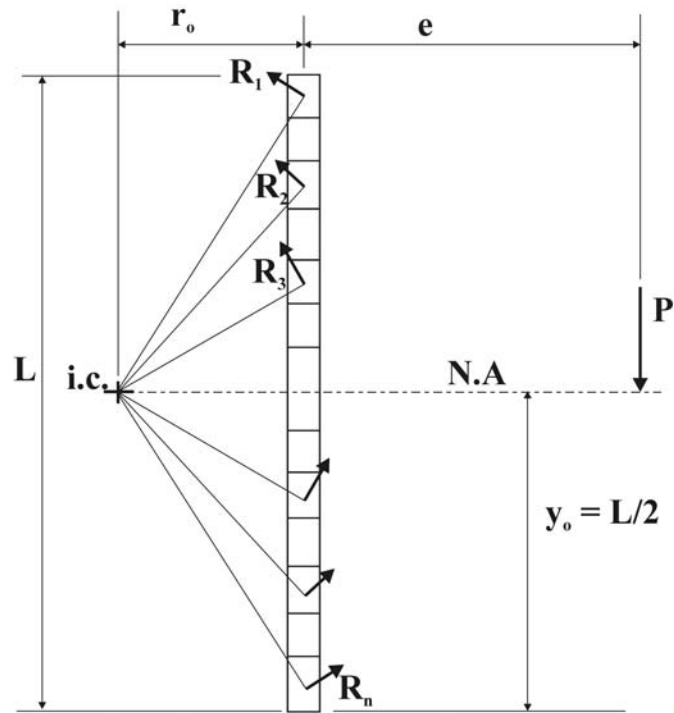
Eccentrically loaded fillet weld (AISC Approach)
